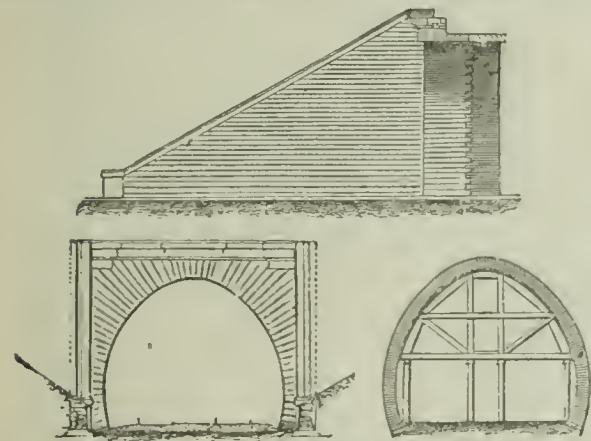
Tunnel under Callander ridge, on the Edinburgh and Glasgow Railway.
